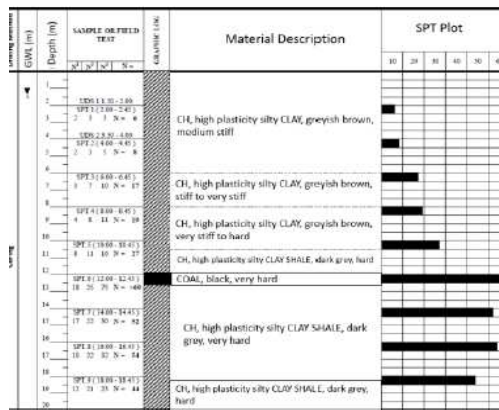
Typical subsurface geotechnical condition beneath the failed embankment section
